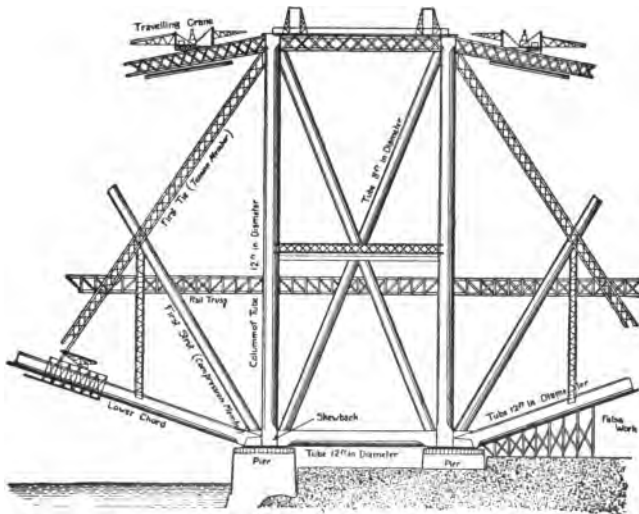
Diagram to show how the cantilever arms of the Forth Bridge were built out.
